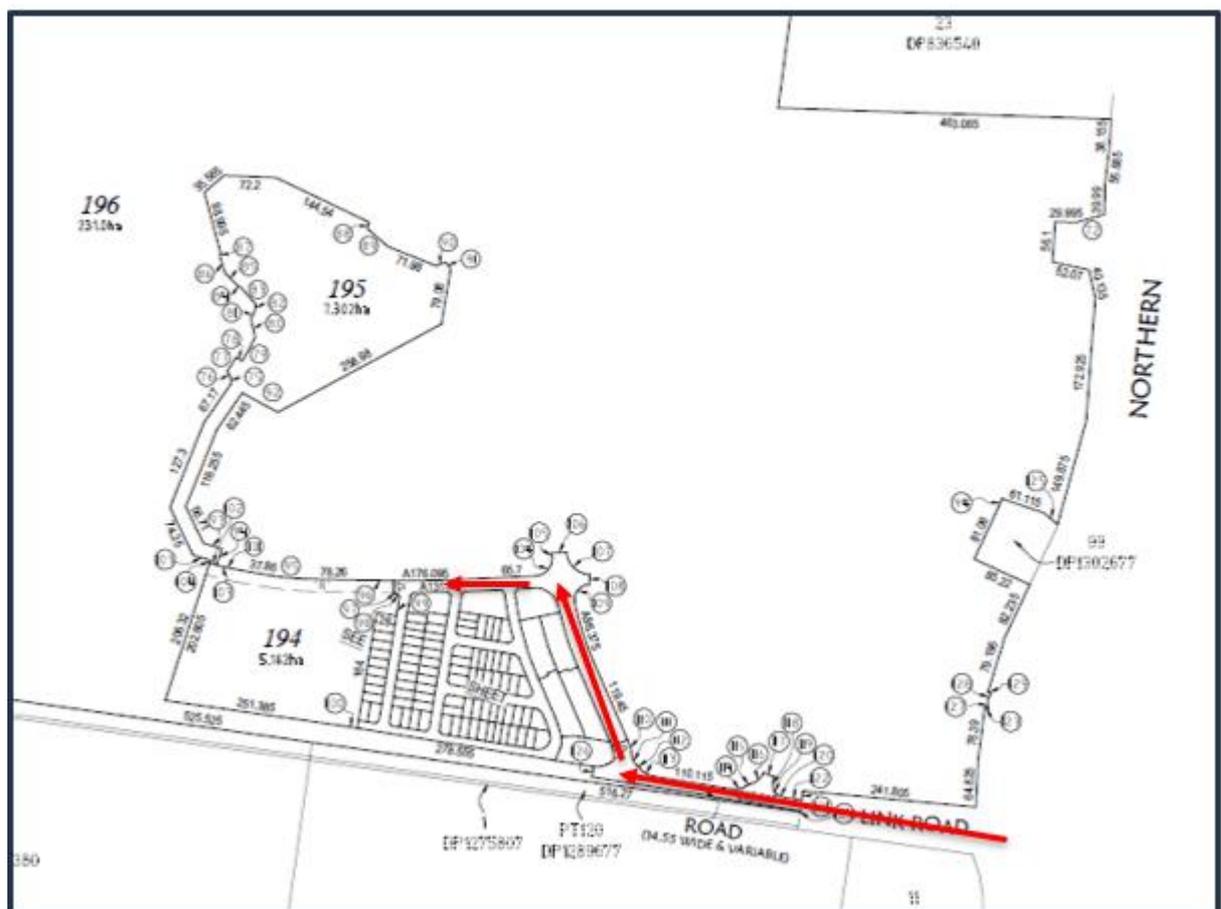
Plan of Subdivision extract showing proposed road network to be constructed with the DA and the connection to the heritage item (Source: Colliers, 2025)
